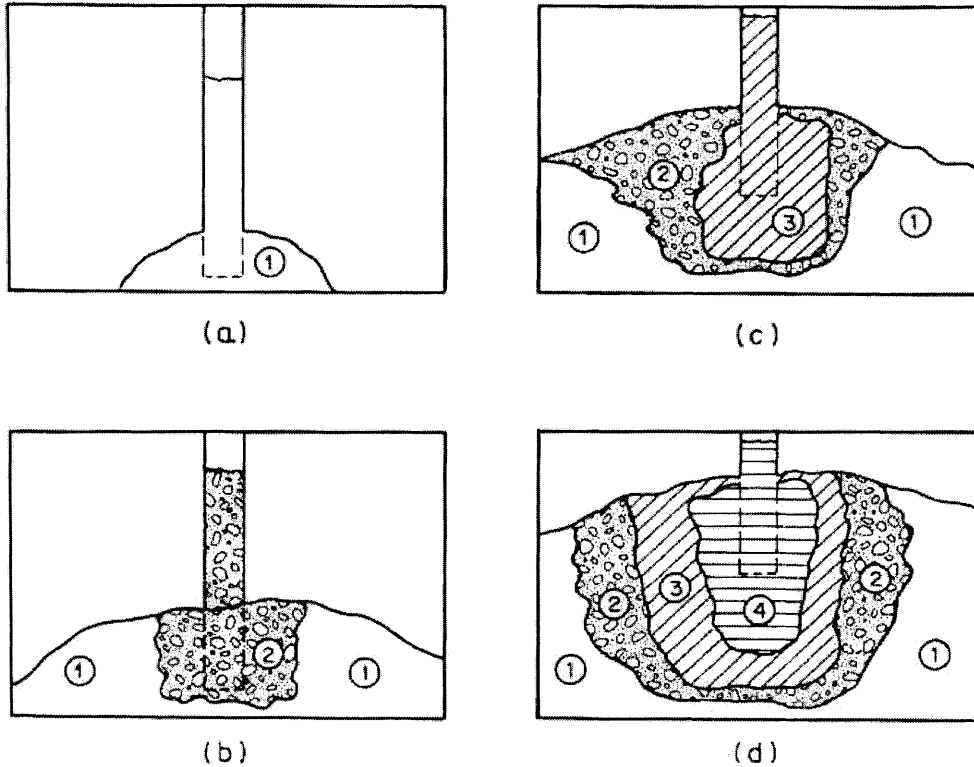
Flow motion of concrete in a long panel through a single tremie pipe: (a) Batch 1 being placed. (b) Batch 2 being placed. (c) Batch 3 being placed. (d) Batch 4 being placed. (extracted from Xanthakos (1994))
